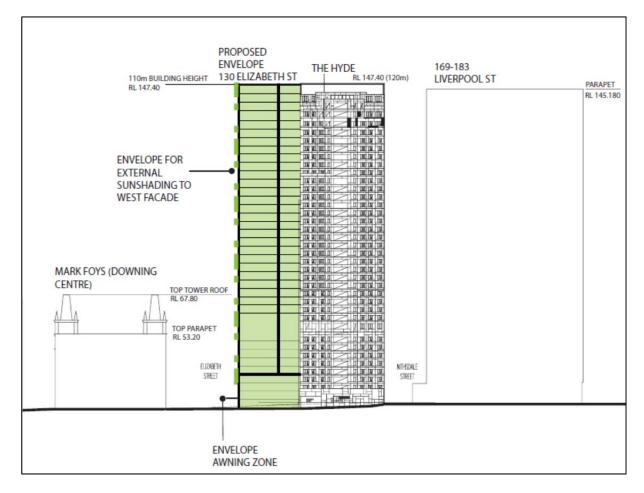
The southern elevation of the proposed building envelope, as viewed from Clarke Street
